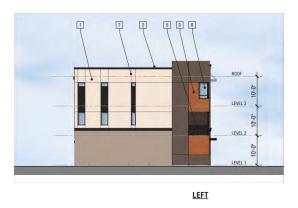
PROJECT ELEVATIONS
